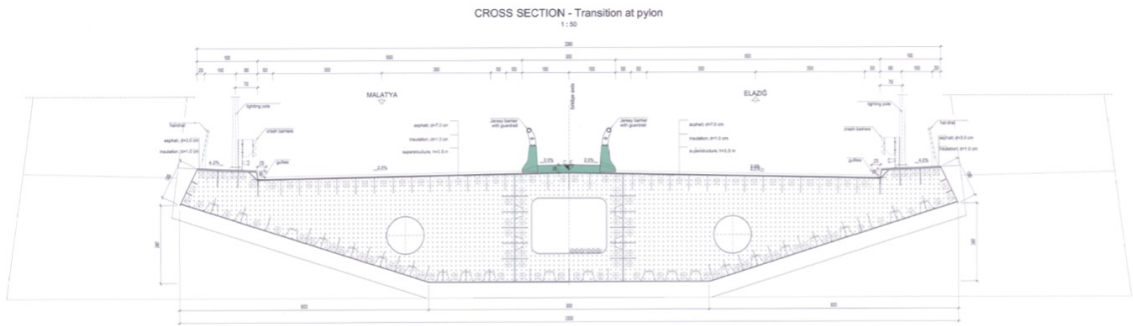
Cross-section detail of the transition between the pylon and the main span.
